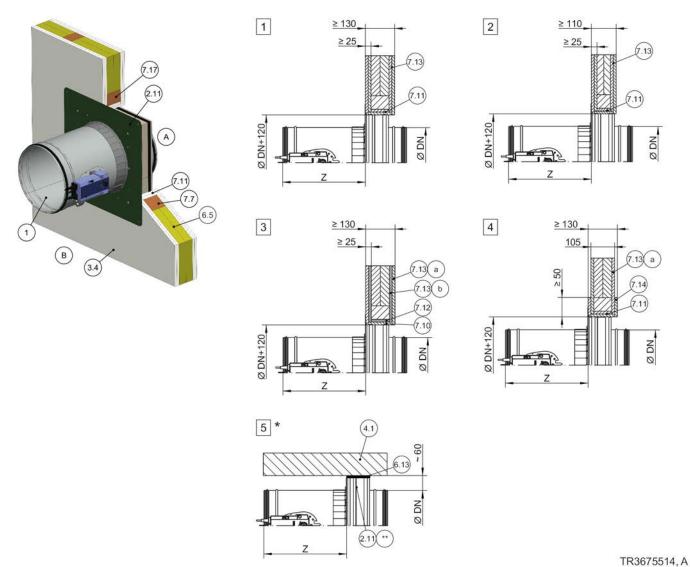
Dry mortarless installation into a lightweight partition wall with timber support structure, with installation kit TO
